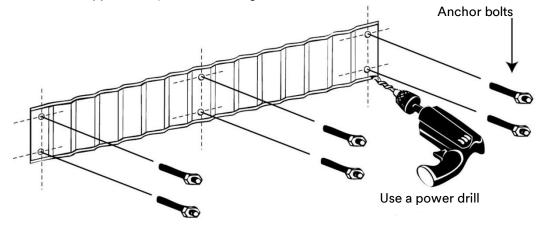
Install anchor bolts using 3M linear delineation system panel as drilling jig.
